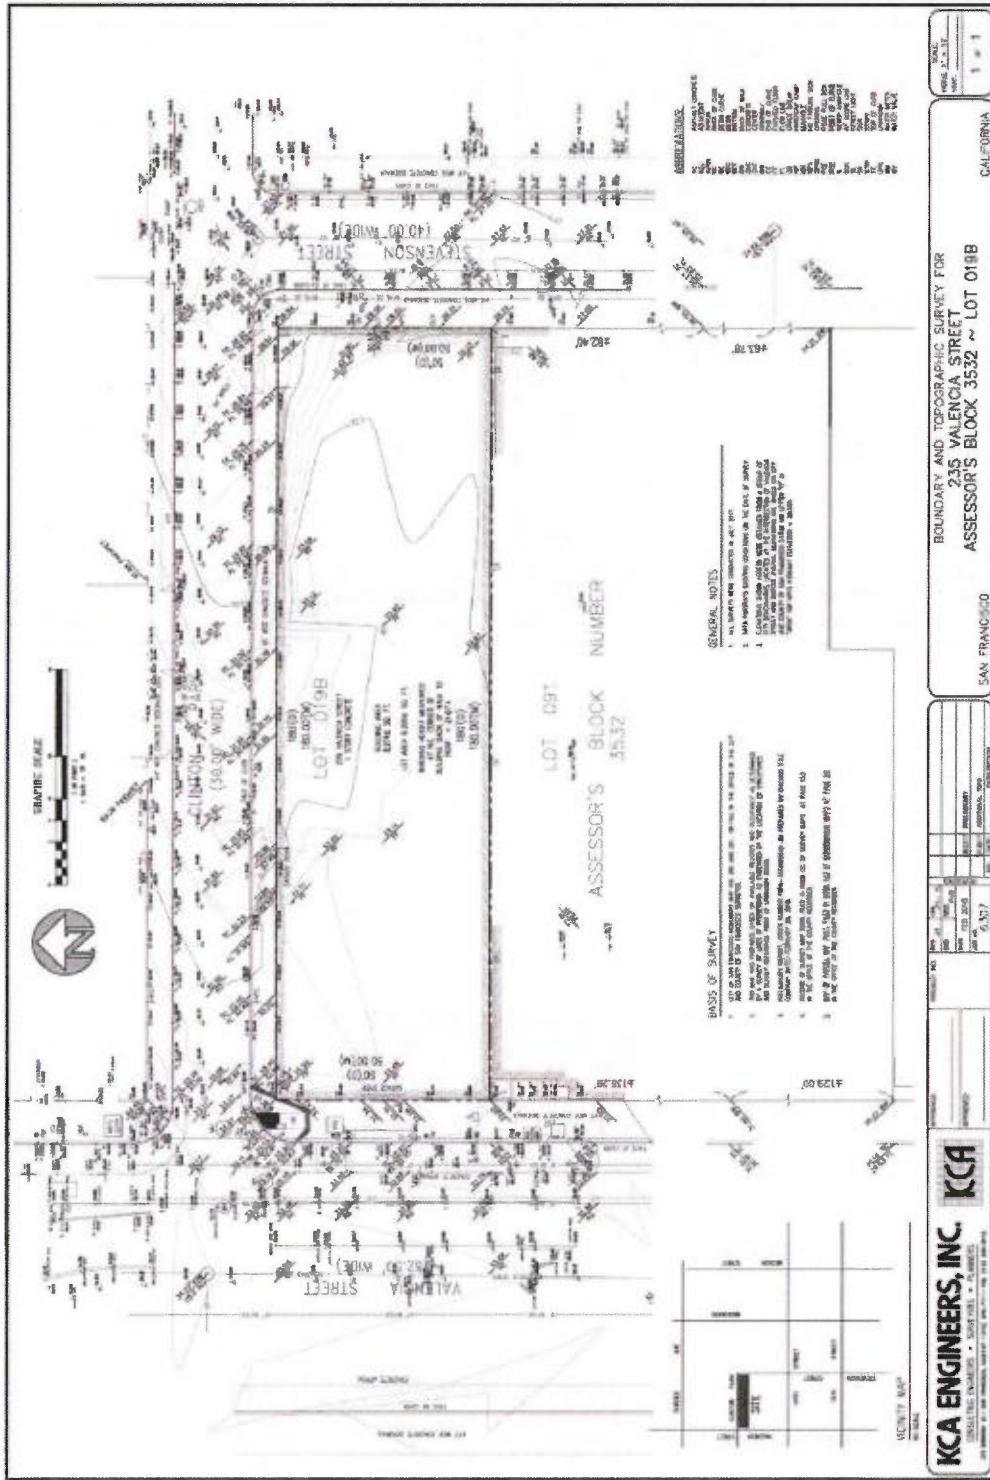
Existing plot plan (Source: KCA Engineers, Inc.)
